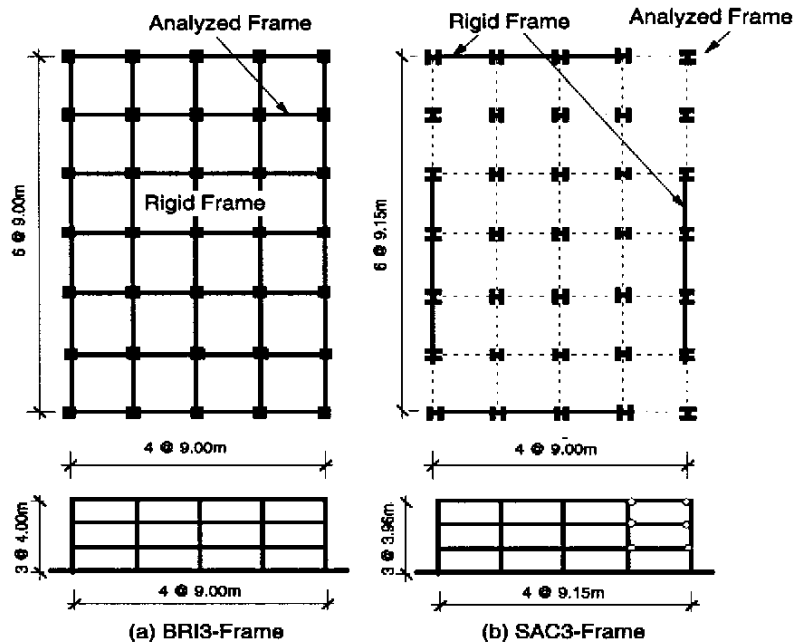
Plan views and analyzed frame elevations for 3-story buildings
